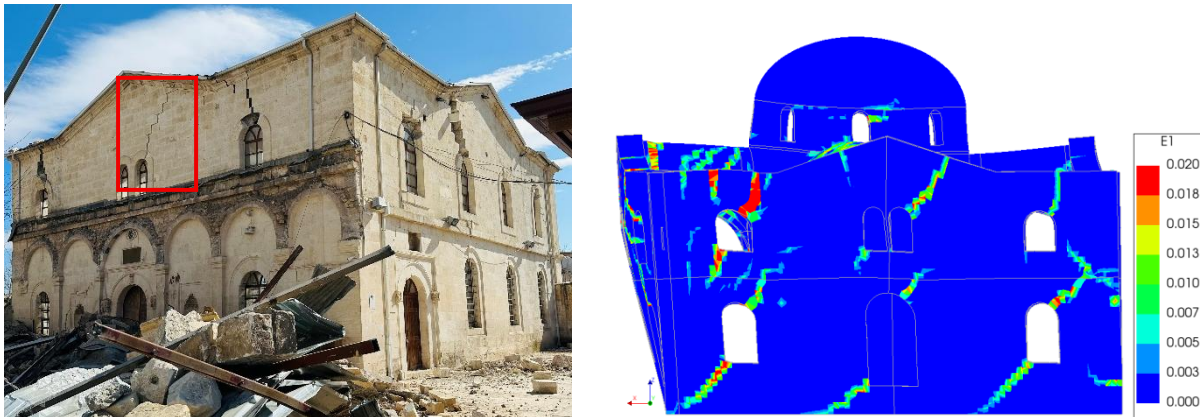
Comparison of actual (left) and numerical (right) damage on North Wall (0.49g)
